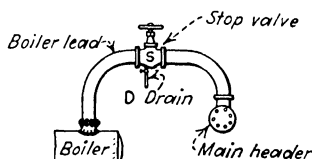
Steam connection equipped with single ordinary stop valve.
